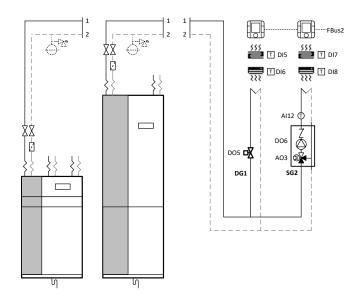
Dual zone wiring scheme directly to the heating / cooling system
